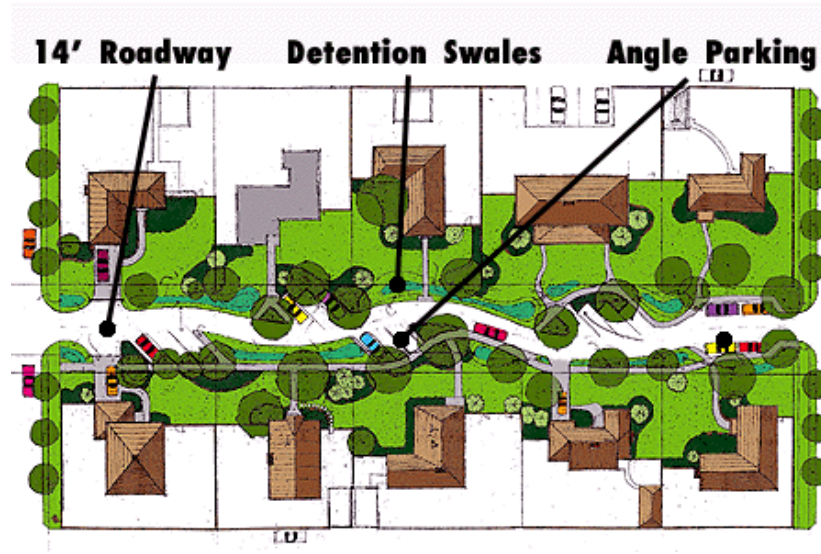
A concept of the SEA Street project shows the 14 foot-wide roadway, swales, vegetation and diagonal parking areas. (Source: [www.djc.com](http://www.djc.com))
